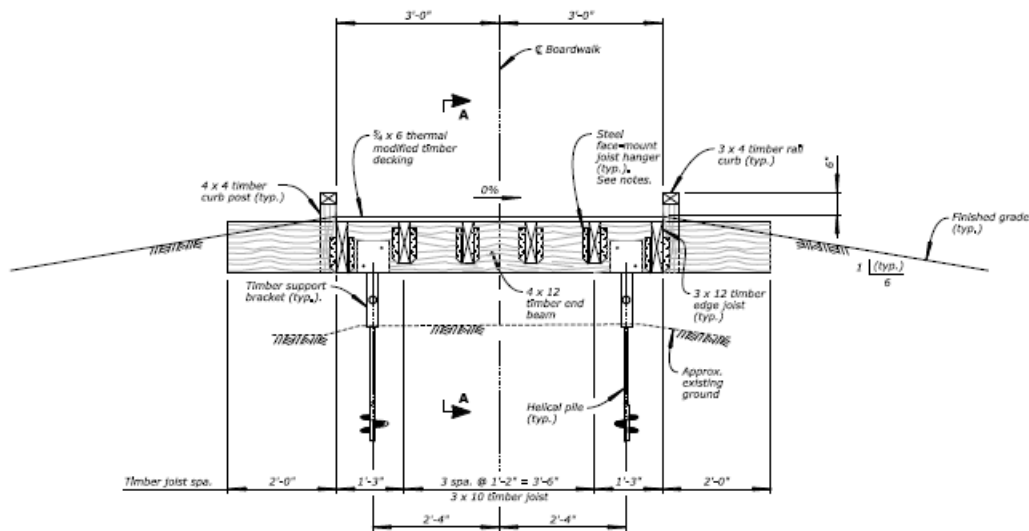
BOARDWALK CONCEPTUAL ABUTMENTS
